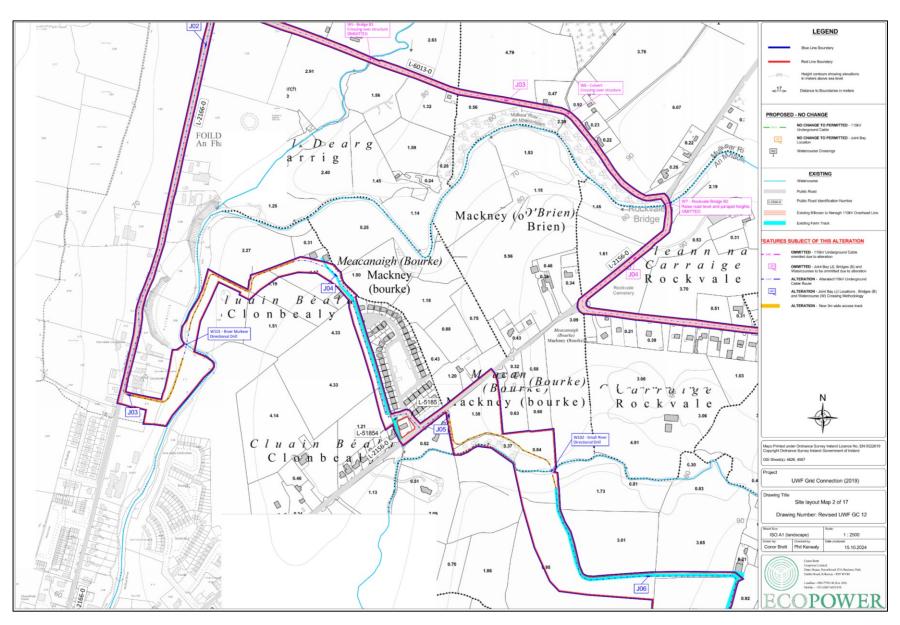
Proposed Alterations (alternate 110kV UGC route and JC02 to JC06) - site layout, 2 of 10 (EDL).
